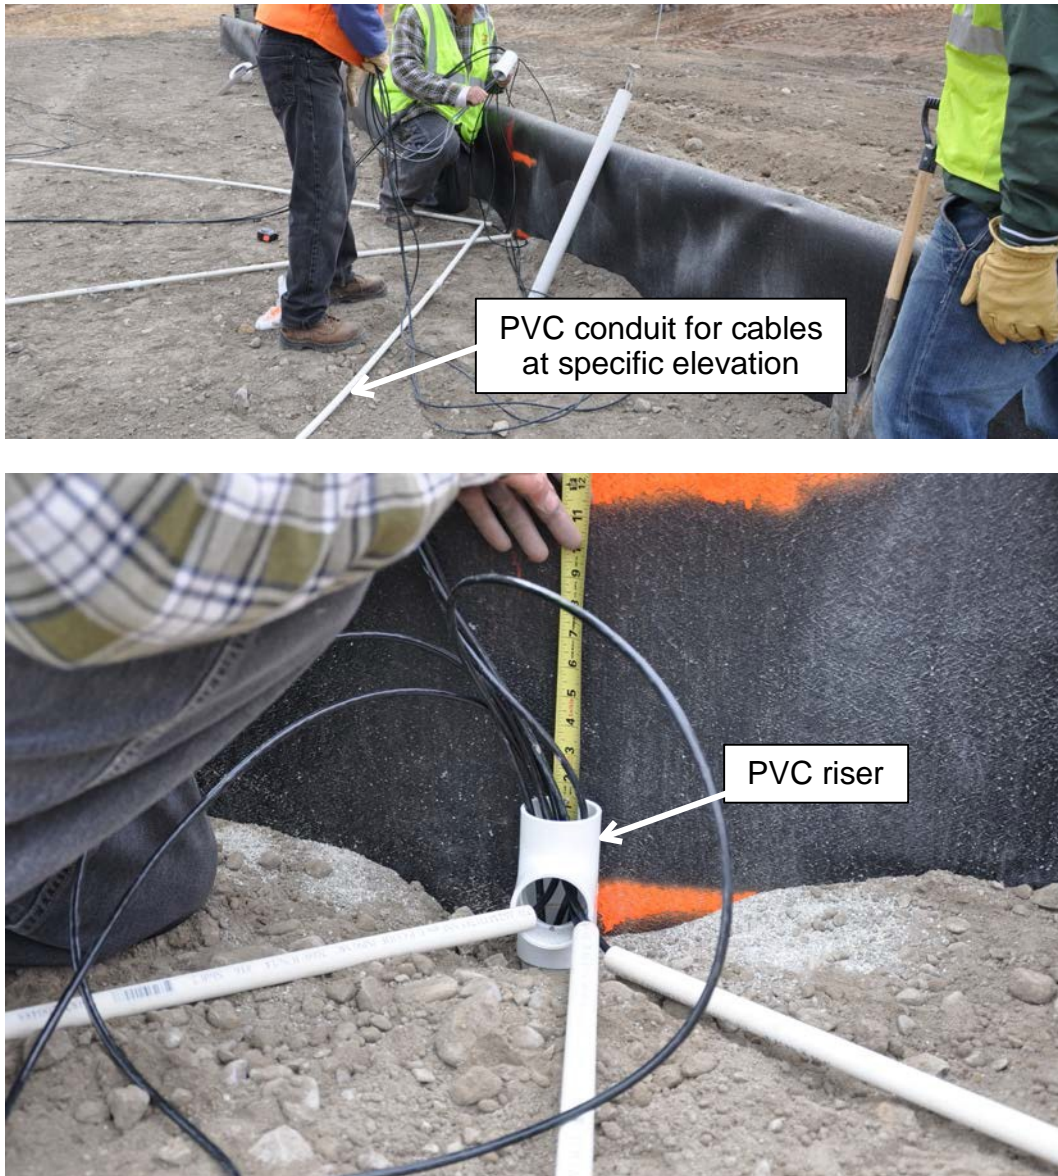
PVC conduit for sensor cables from specific elevation (upper) and vertical riser for all cables (lower).
